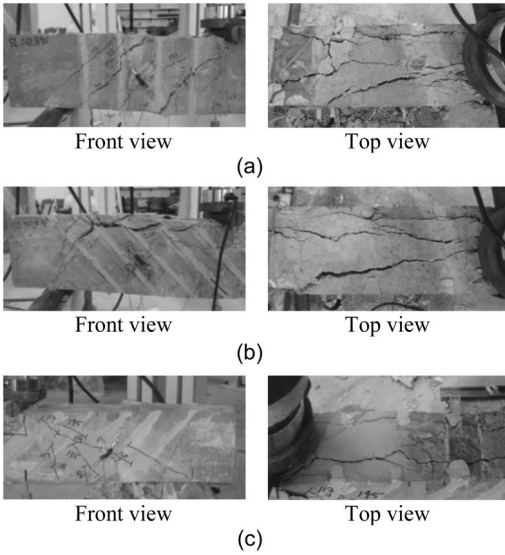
Failure mode of sample retrofitted specimens. (a) non-damaged specimen S1-ND-R90. (b) non-damaged specimen S2-ND-R45. (c) pre-failed specimen S1-D2-R45.
